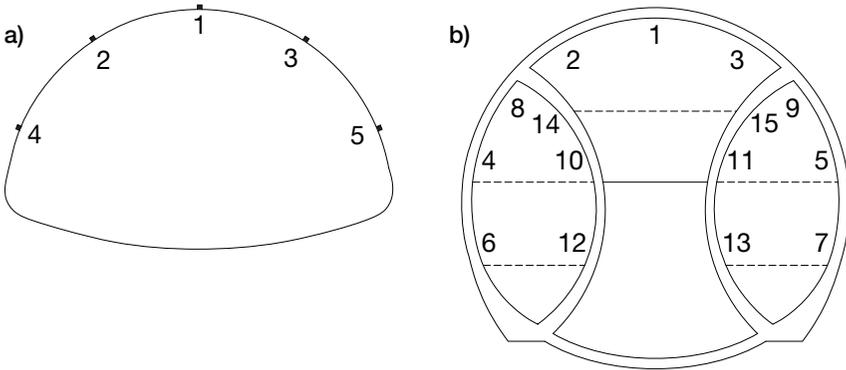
Examples of a measuring profile a) for a crown and, b) a double track tunnel excavated with side wall drifts
